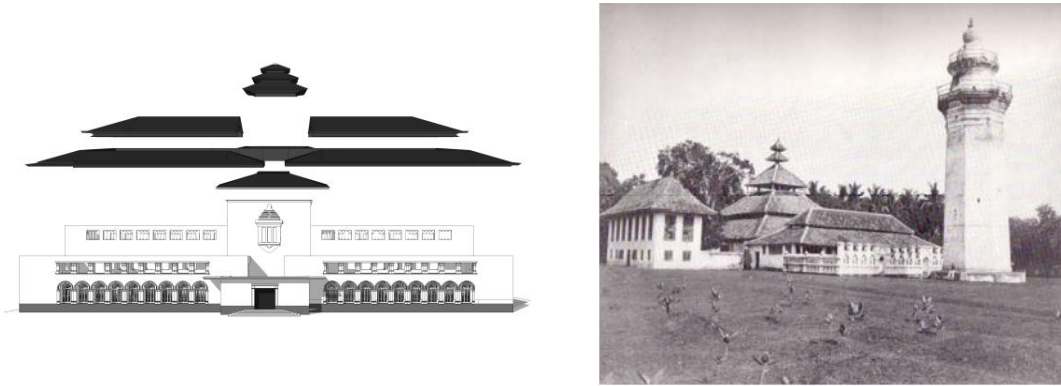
(a): Separation of Roof and Walls, (b) A Traditional Sundanese Building *Bale Nyungcung* [15]
